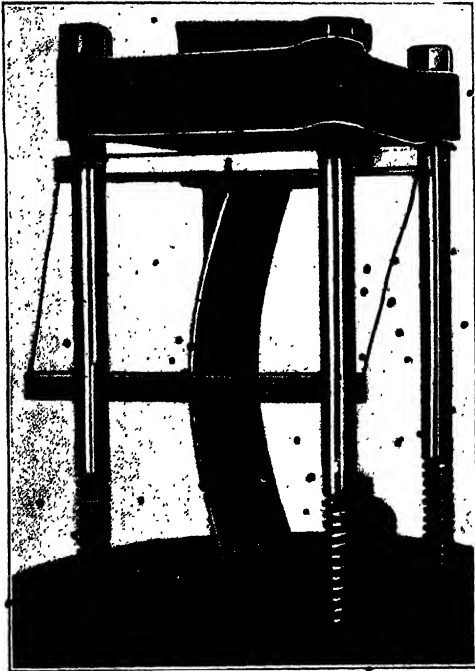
A PLYWOOD COLUMN READY FOR TEST.
